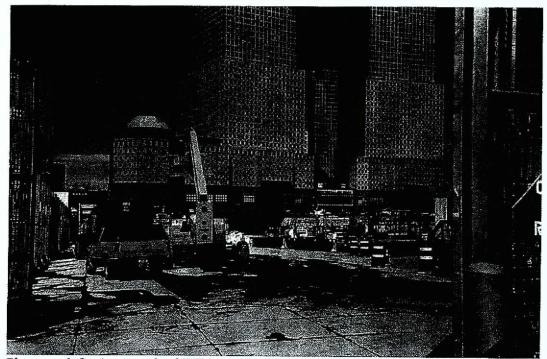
Footprint of WTC Building 4, looking southeast. Intersection of Liberty and Church Streets in background.
